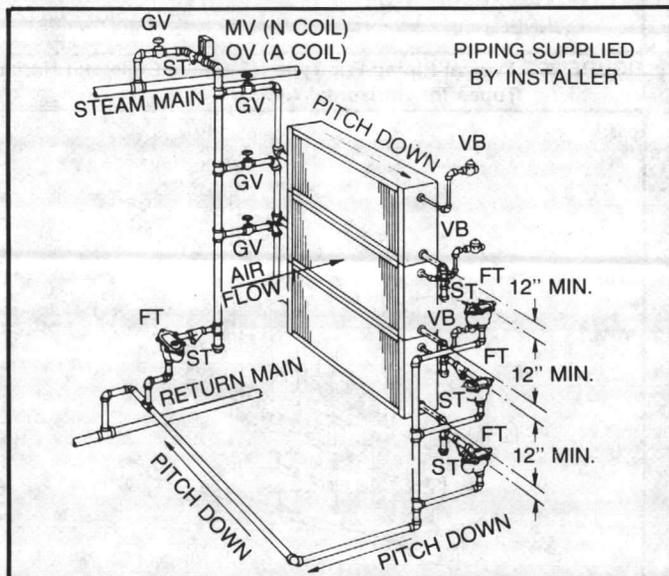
Typical Piping for Type A or N Steam Coils, Horizontal Tubes for Horizontal Airflow
